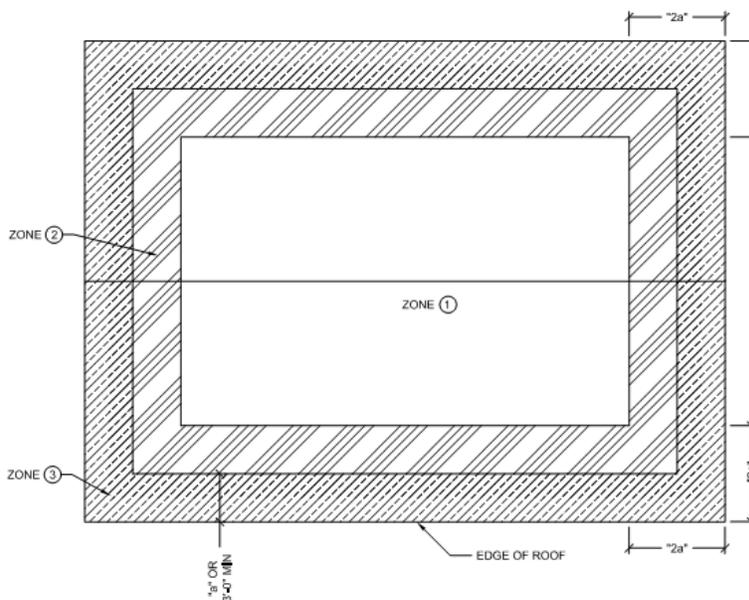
Roof Edge and Corner Zones, Open Gable Roofs,  $\theta \leq 10^\circ$
